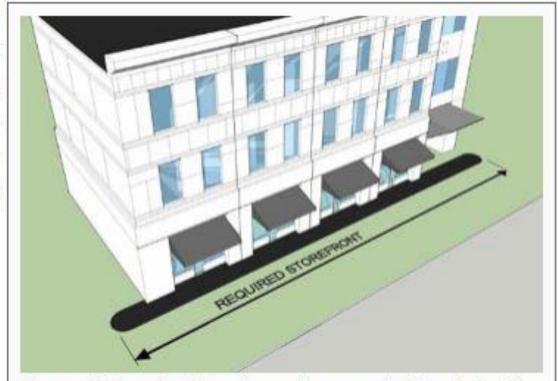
Required Storefront. Areas on the Regulating Plan which are shown with a heavy black line are required to have ground-floor storefront windows and meet certain facade transparency requirements.
